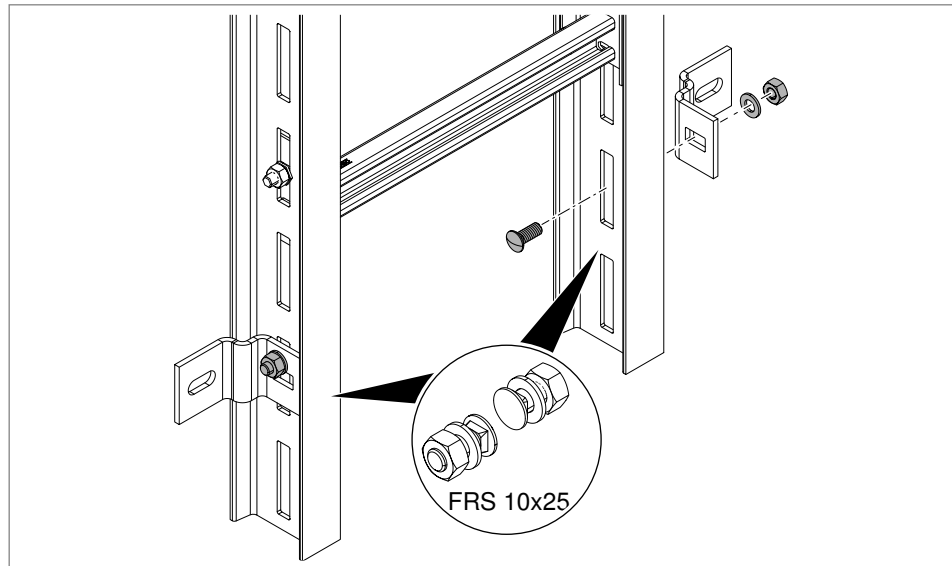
Fasten fastening bracket BW to vertical ladder SLS
